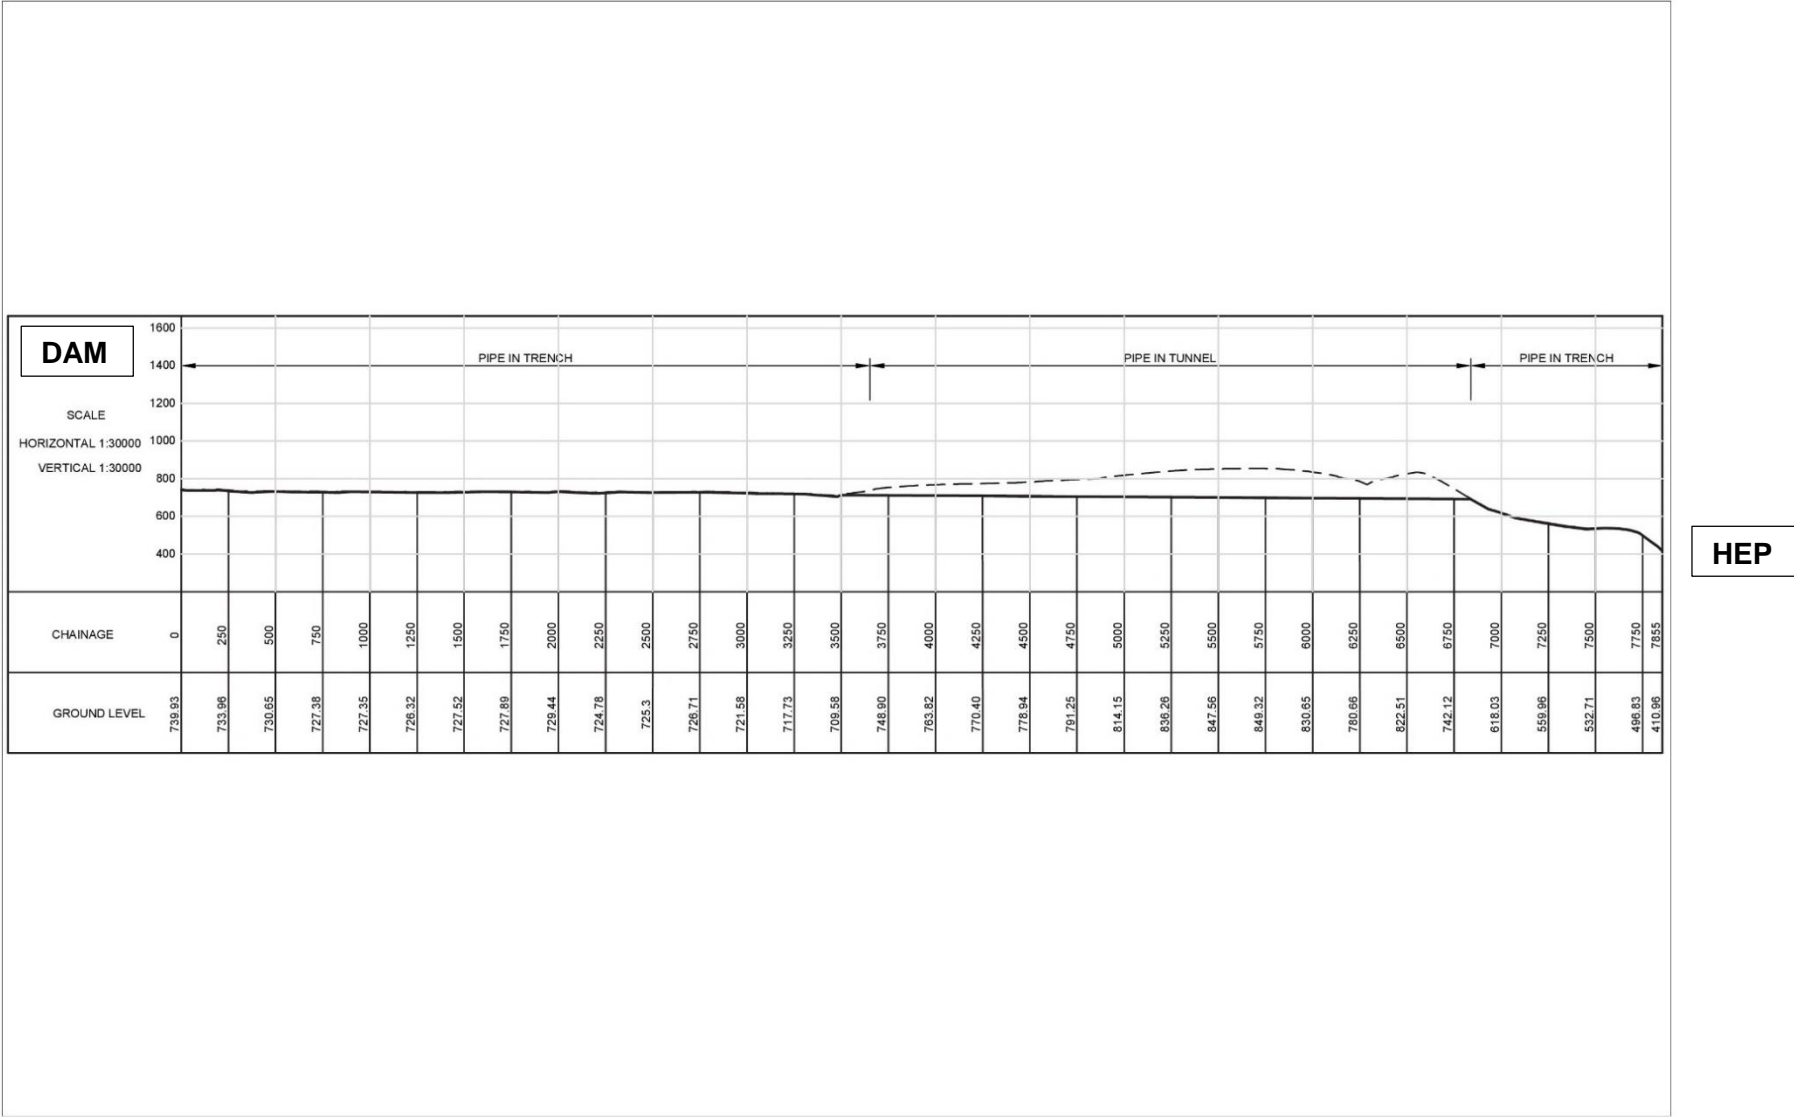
Option 3 Hydropower Conduit Longitudinal Section
